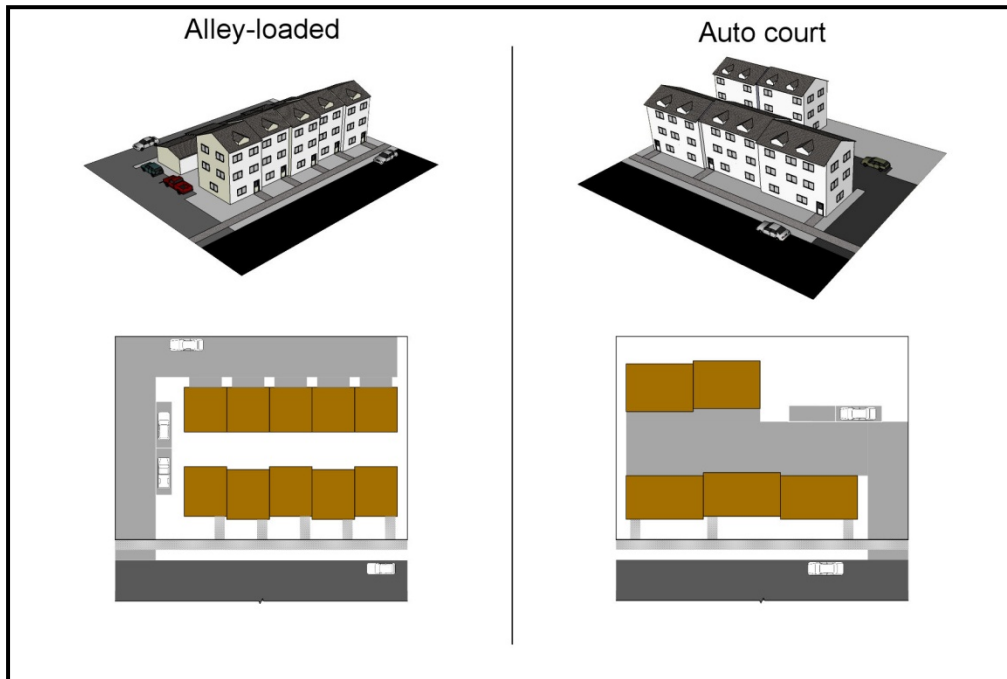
B Isometric and plan views of alley-loaded and auto court configurations.
